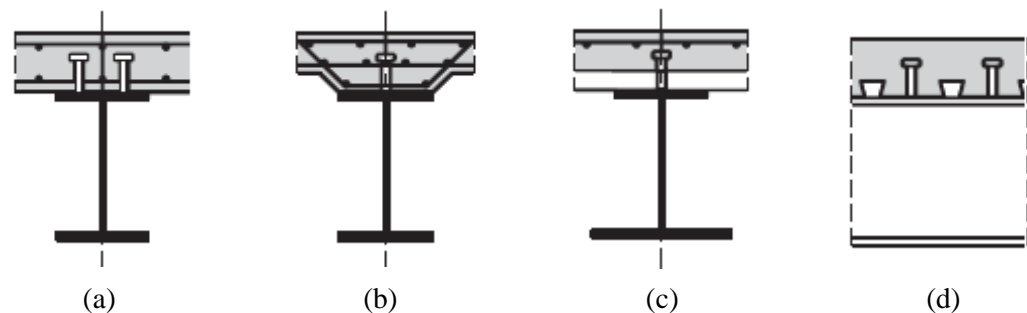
Composite floors: (a,b) solid concrete slab, (c,d) profiled steel sheeting slab.
